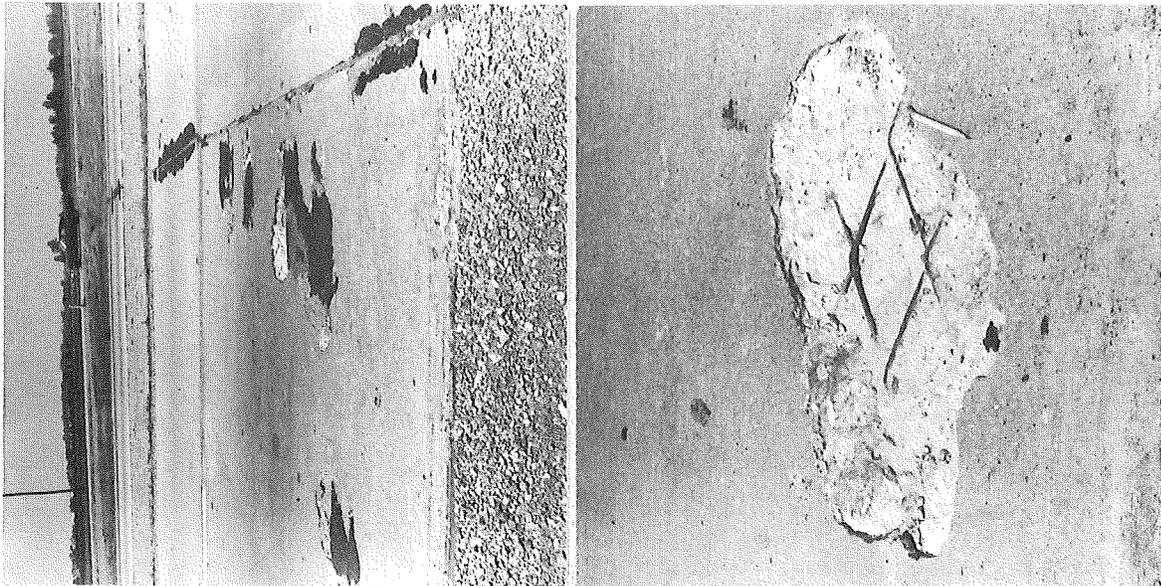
Surface deterioration and spalling (top), and exposure of reinforcing steel (bottom) on Belleville Road underpass; note proximity of steel to pavement surface.
